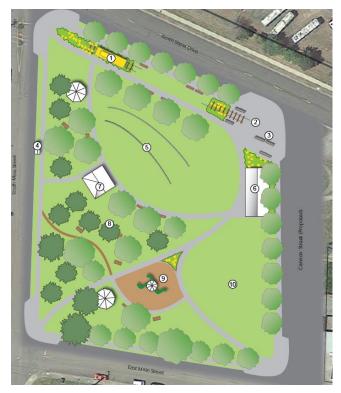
The vision for Rolling Rock to be a "central park." Photo from Lowell Parks Master Plan.
